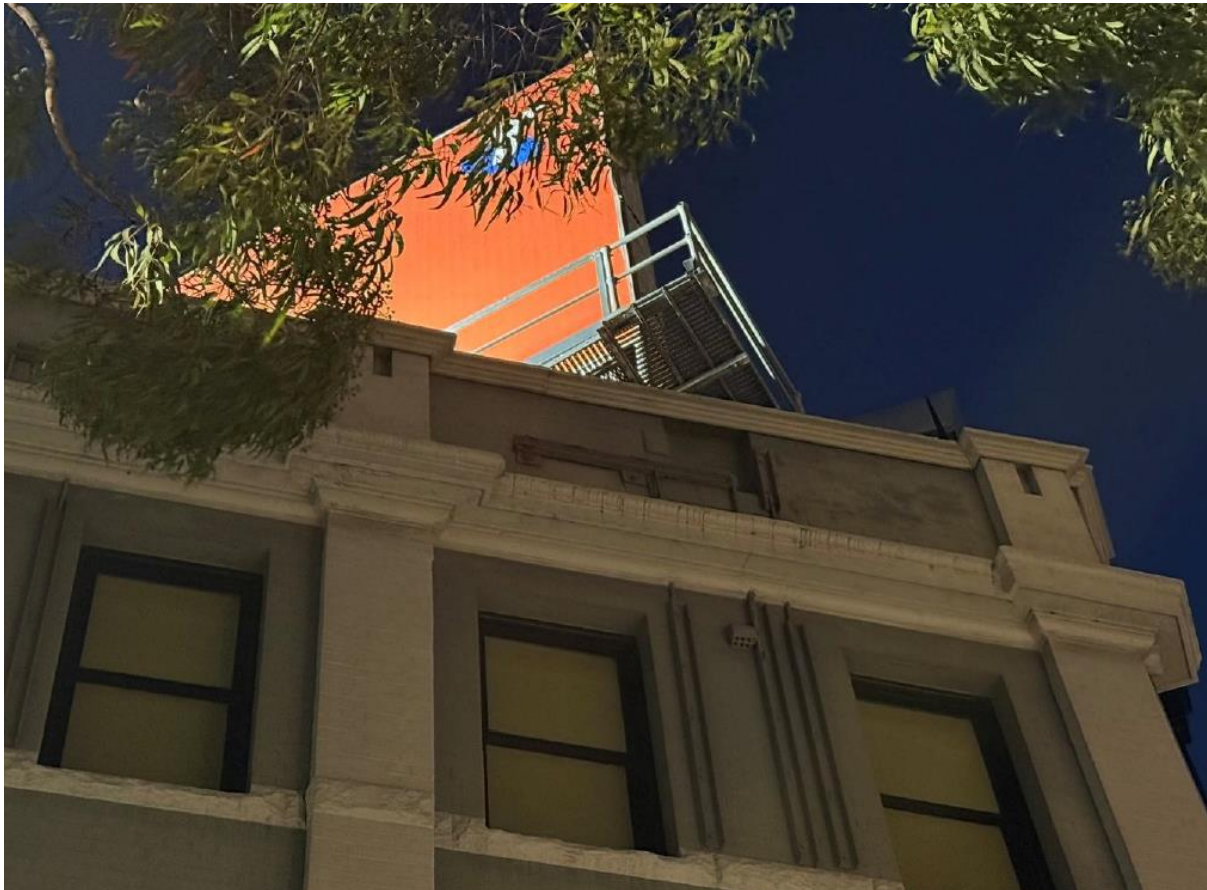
Existing structure/gantry shown sitting over the parapet wall to Bourke Street
